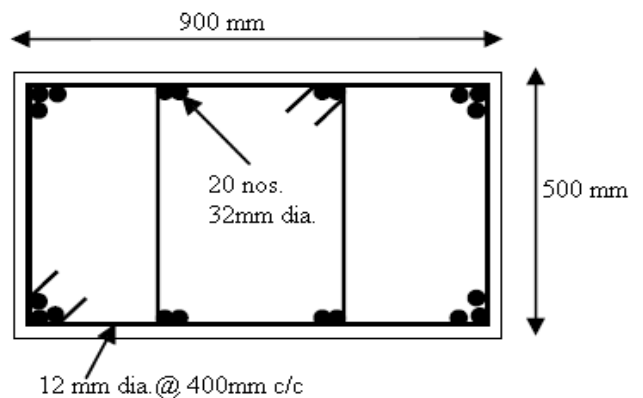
Cross section of the NSC column- ordinary detailing 400 mm stirrups spacing
